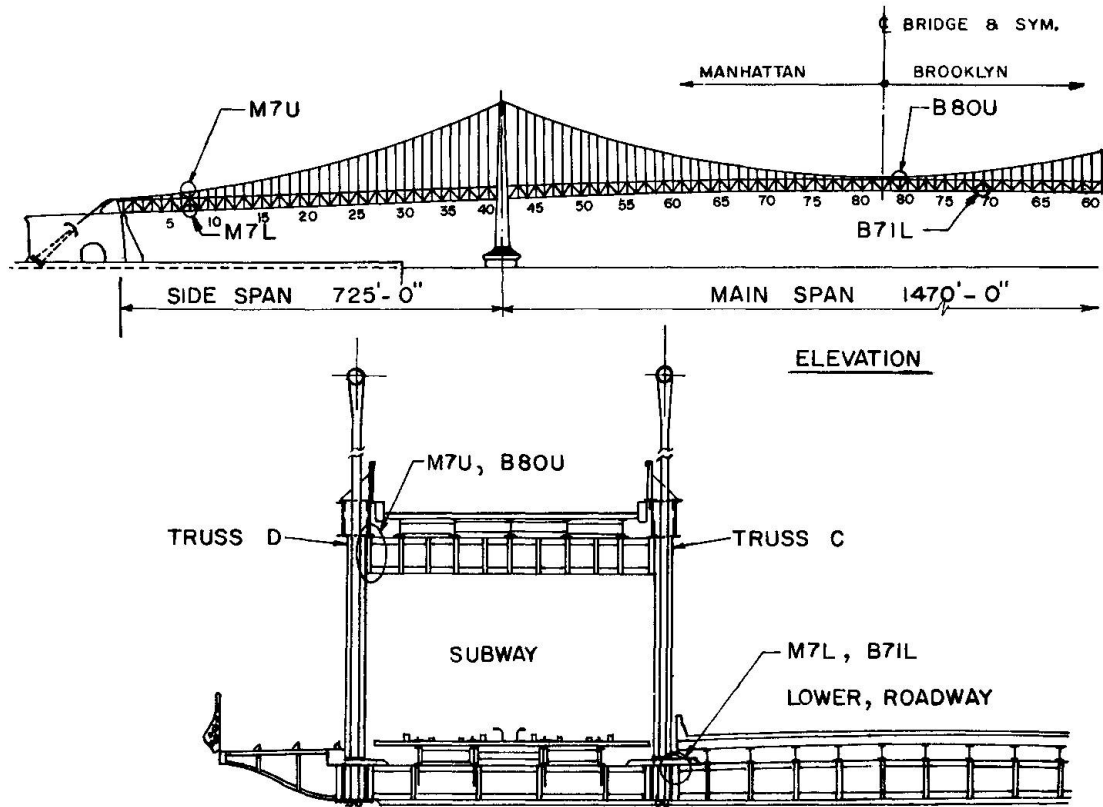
Manhattan Bridge: Elevation and Typical Cross Section; Strain Gage Locations are Indicated
